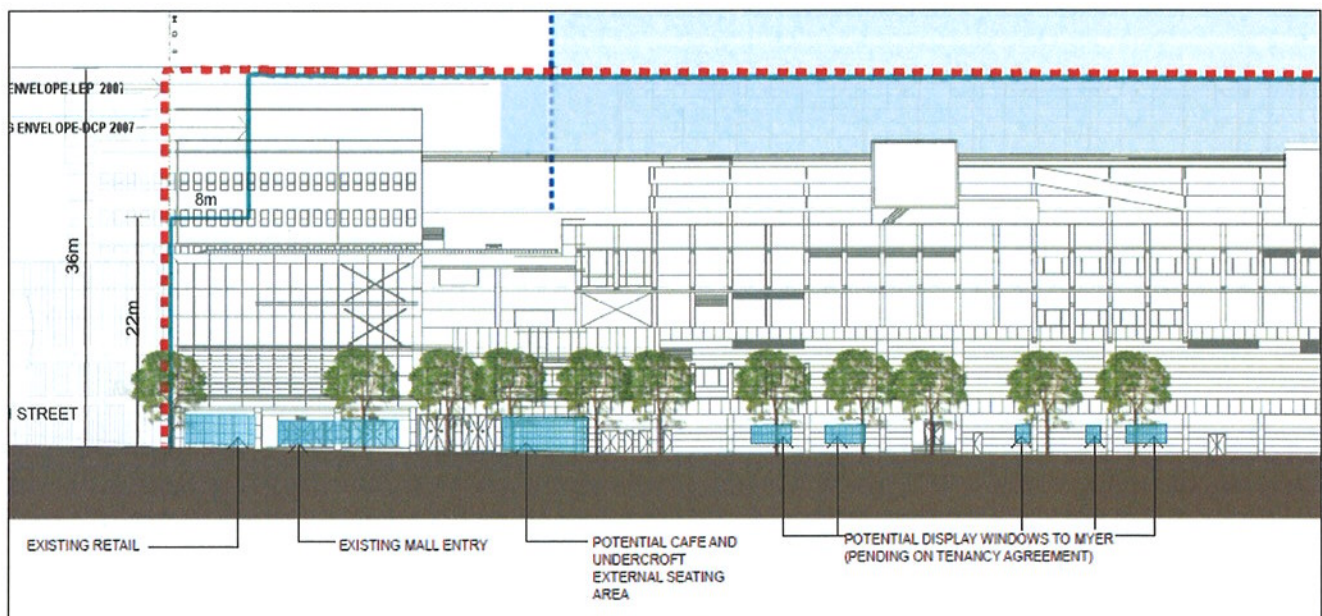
Proposed new ground floor openings to Argyle Street (source: Proponent's EA)
